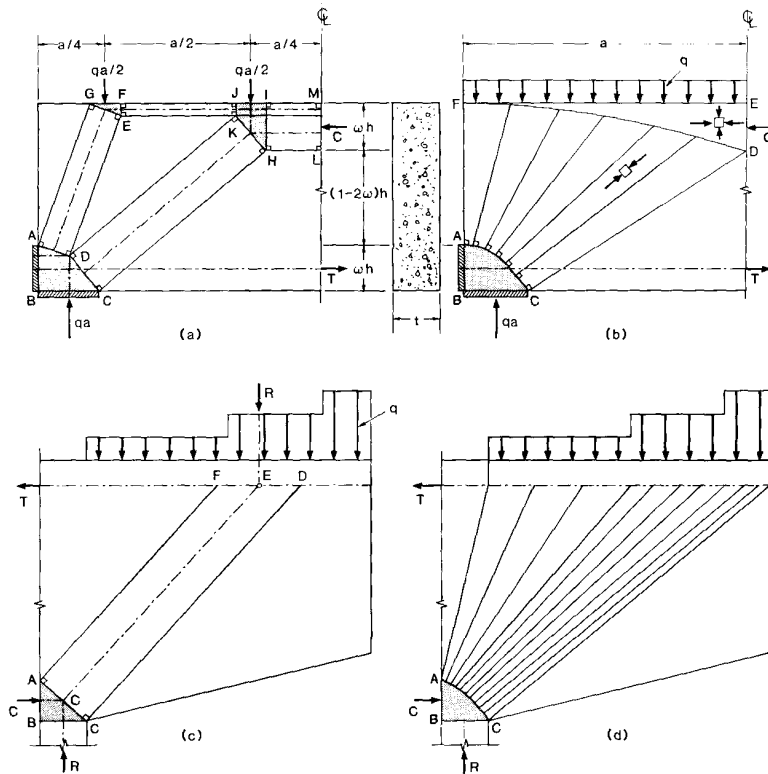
Fan action: (a) Strut and tie model of uniformly loaded deep beam; (b) Fan-shaped stress field; (c) Strut and tie system for equivalent single load R replacing distributed load q ; (d) Continuous fan developed from discrete strut
